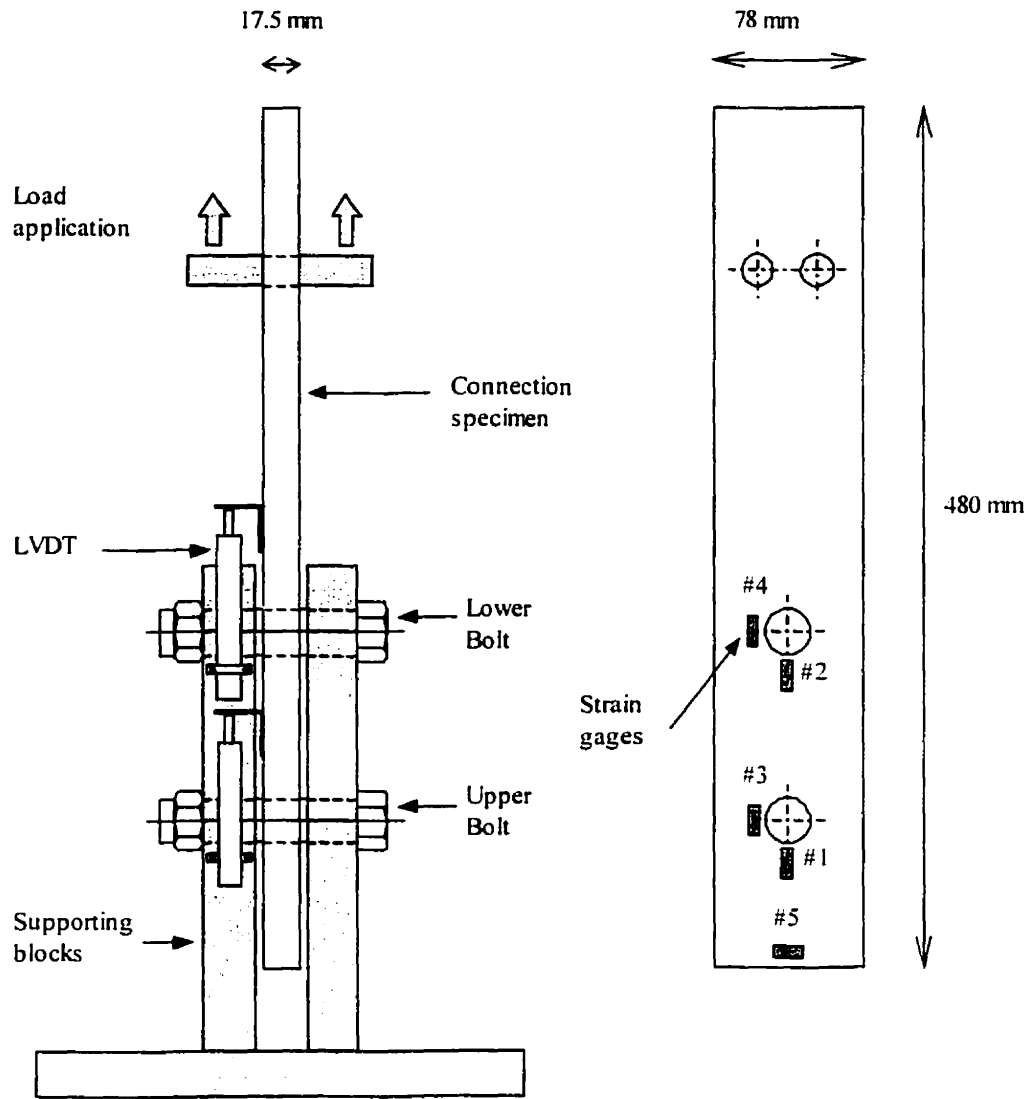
10 Location of Strain Gages on a Two-Bolt Connection Specimen
